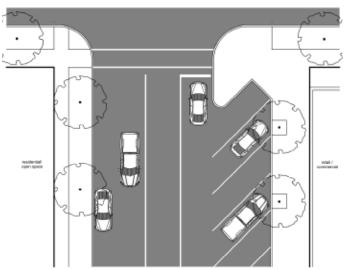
(1). Typical Major Local Urban Street B with Parking on one side.
